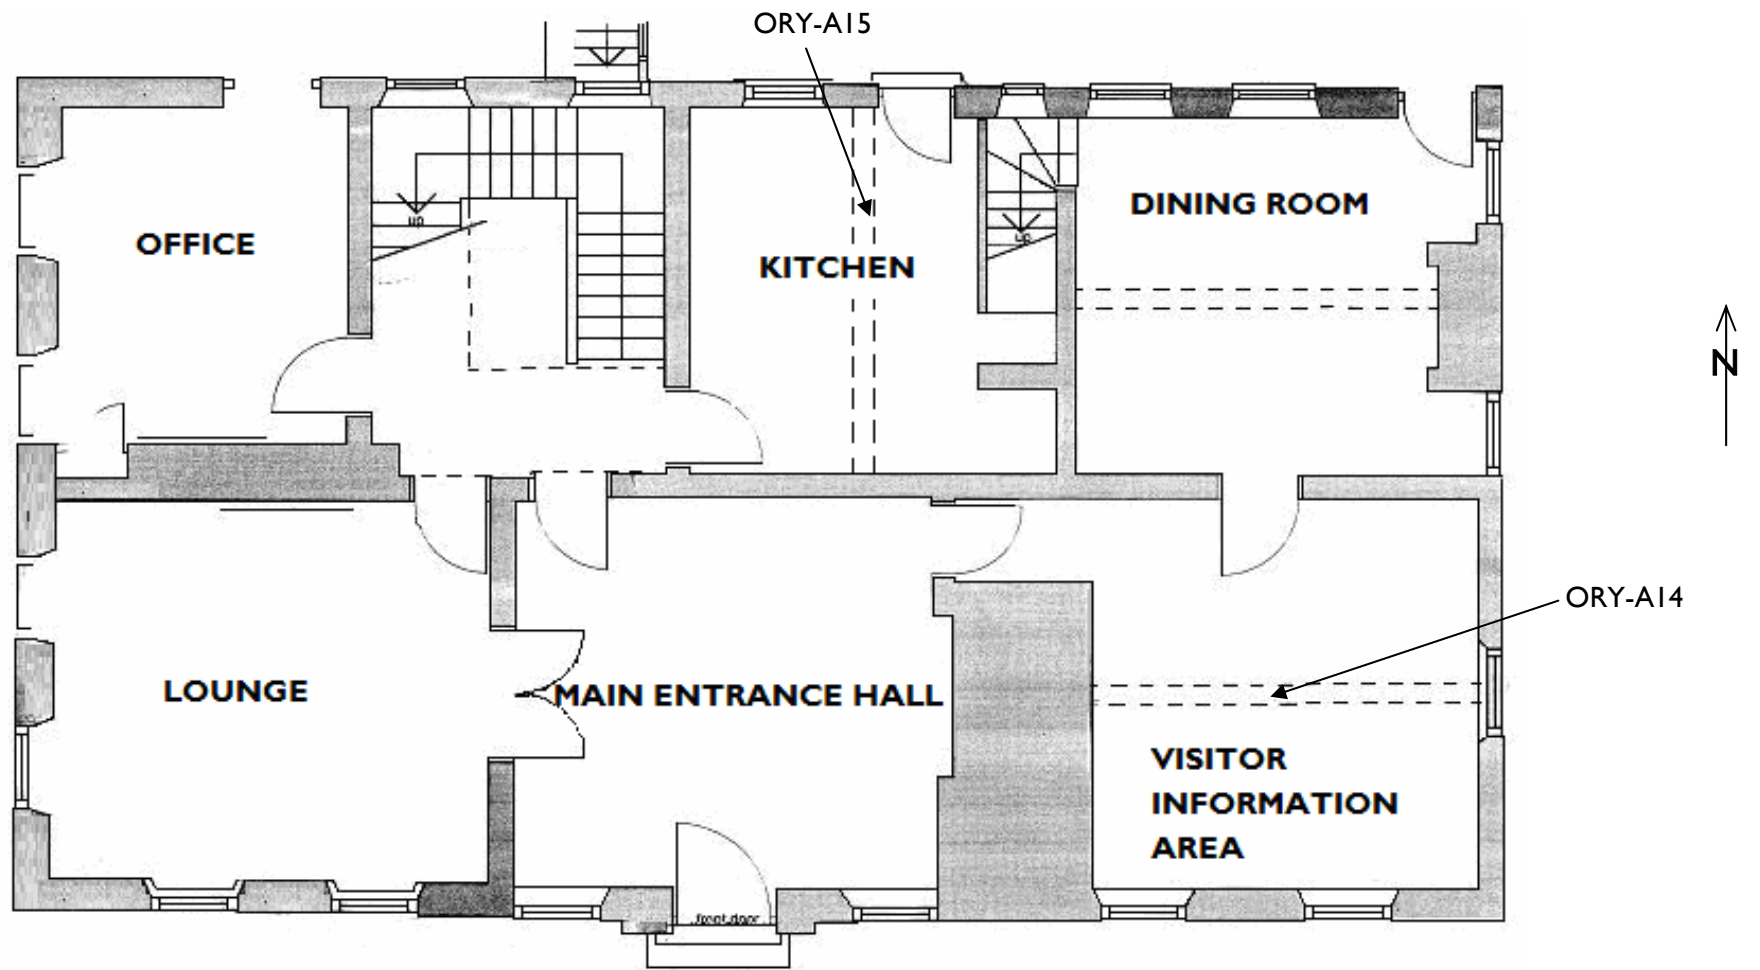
The Old Rectory; Ground-floor plan, showing the location of samples ORY-A14 and ORY-A15 (David Glew Architect & Surveyor)
